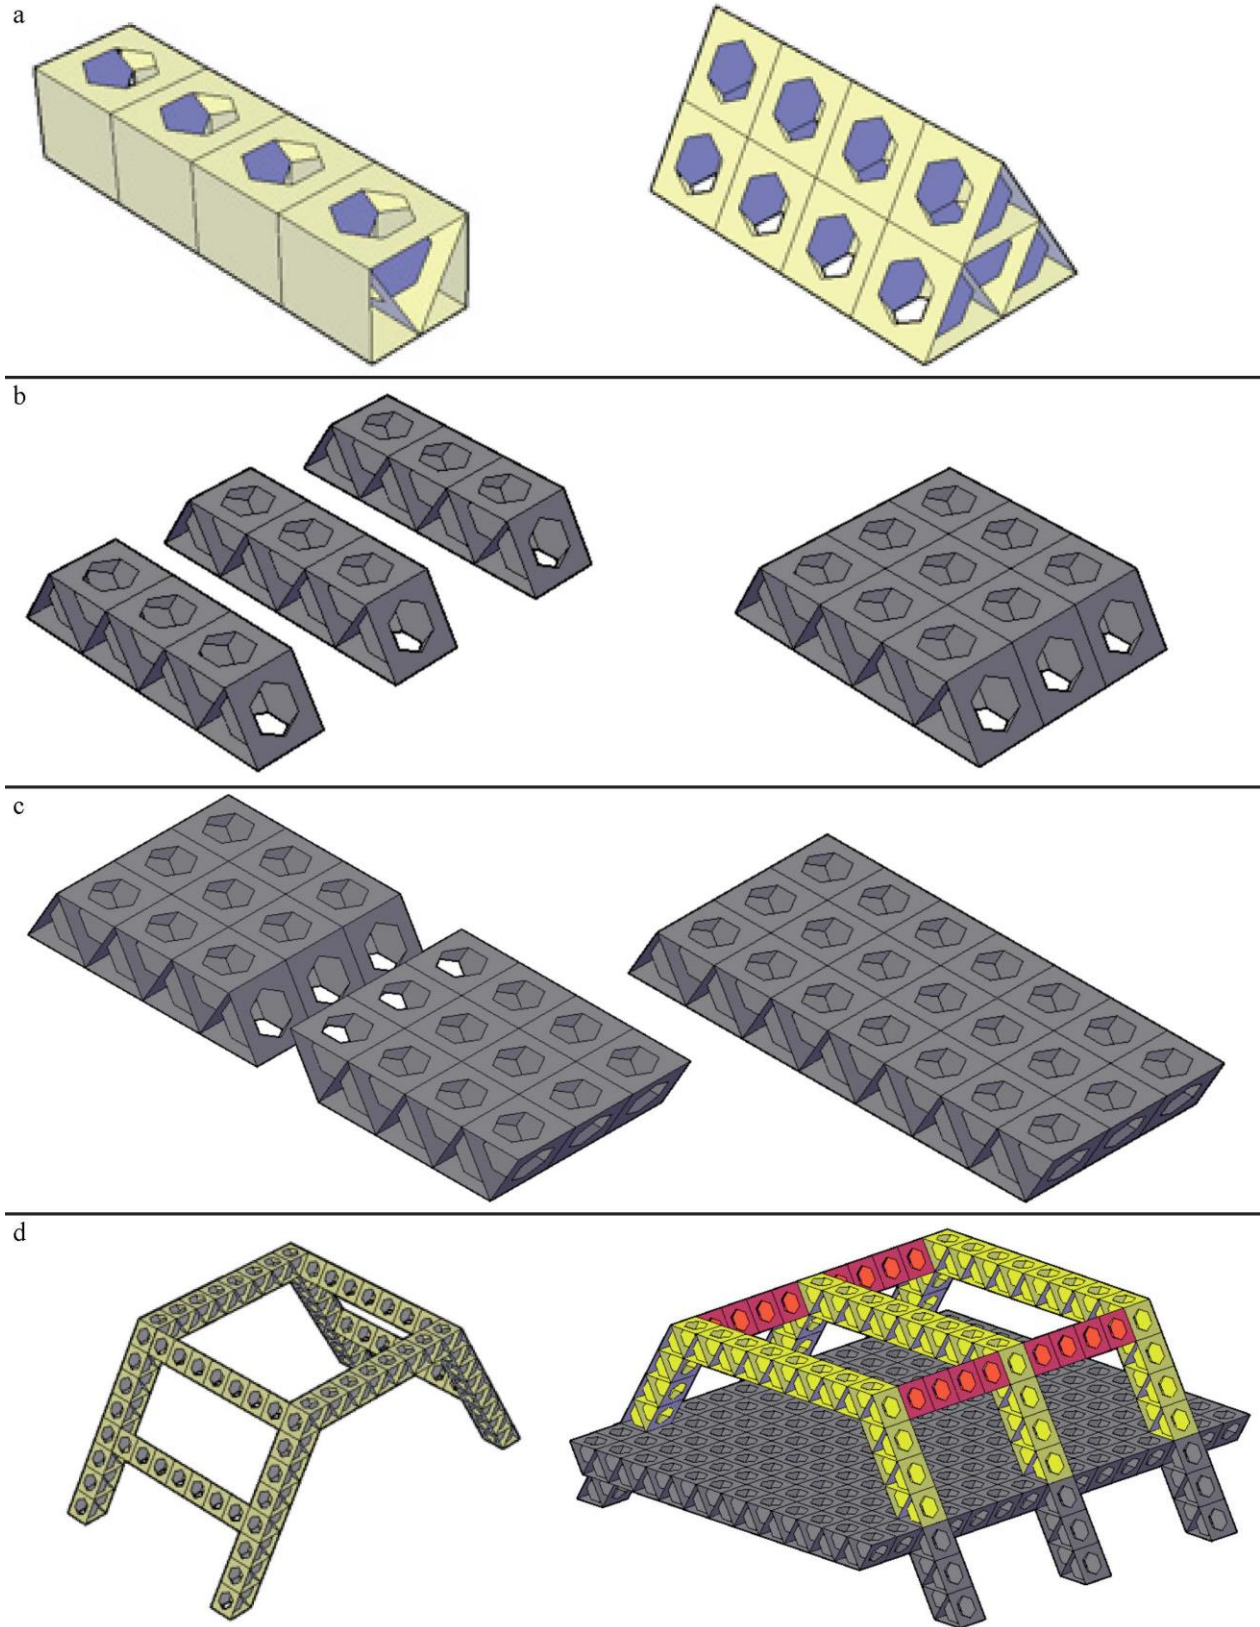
Extended and assembled forms of self-braced folded sections. a) Non-triangular sections. b), c) Floor slab assembly. d) Frame assembly.
